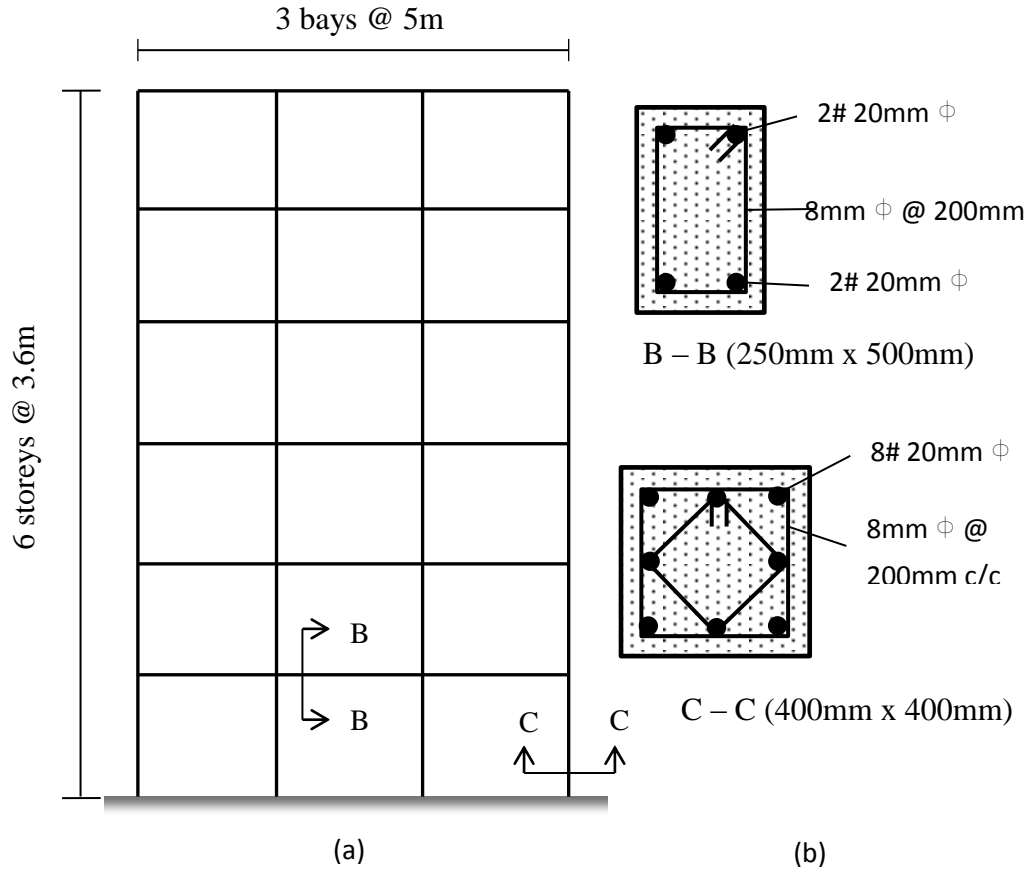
(a) Elevation of the RC Frame and (b) Reinforcement details of beams and columns
